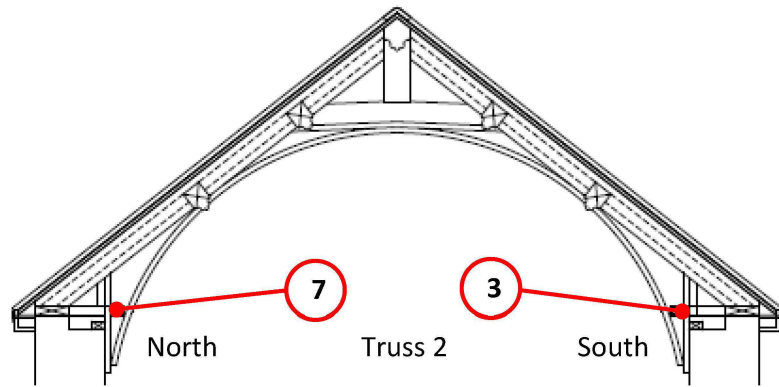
c: Sections through the nave roof trusses to locate sampled timbers
